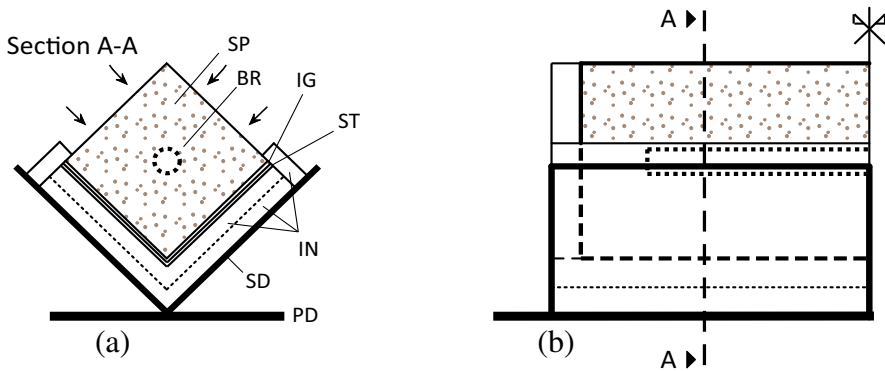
Front (a) and lateral view (b) of the specimens tested in this project; SP = specimen; BR = bar; IN = insulating plate; IG = impregnating coating + glue; ST = steel barrier; SD = V-shaped supporting saddle; and PD = pedestal.
